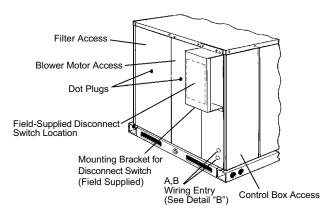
UNIT DIMENSIONS (REAR VIEW)
